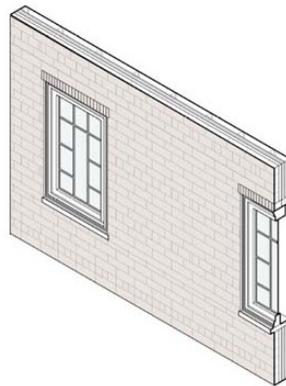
Chestertown, MD – Wall Detail, Source- Author, 2014
